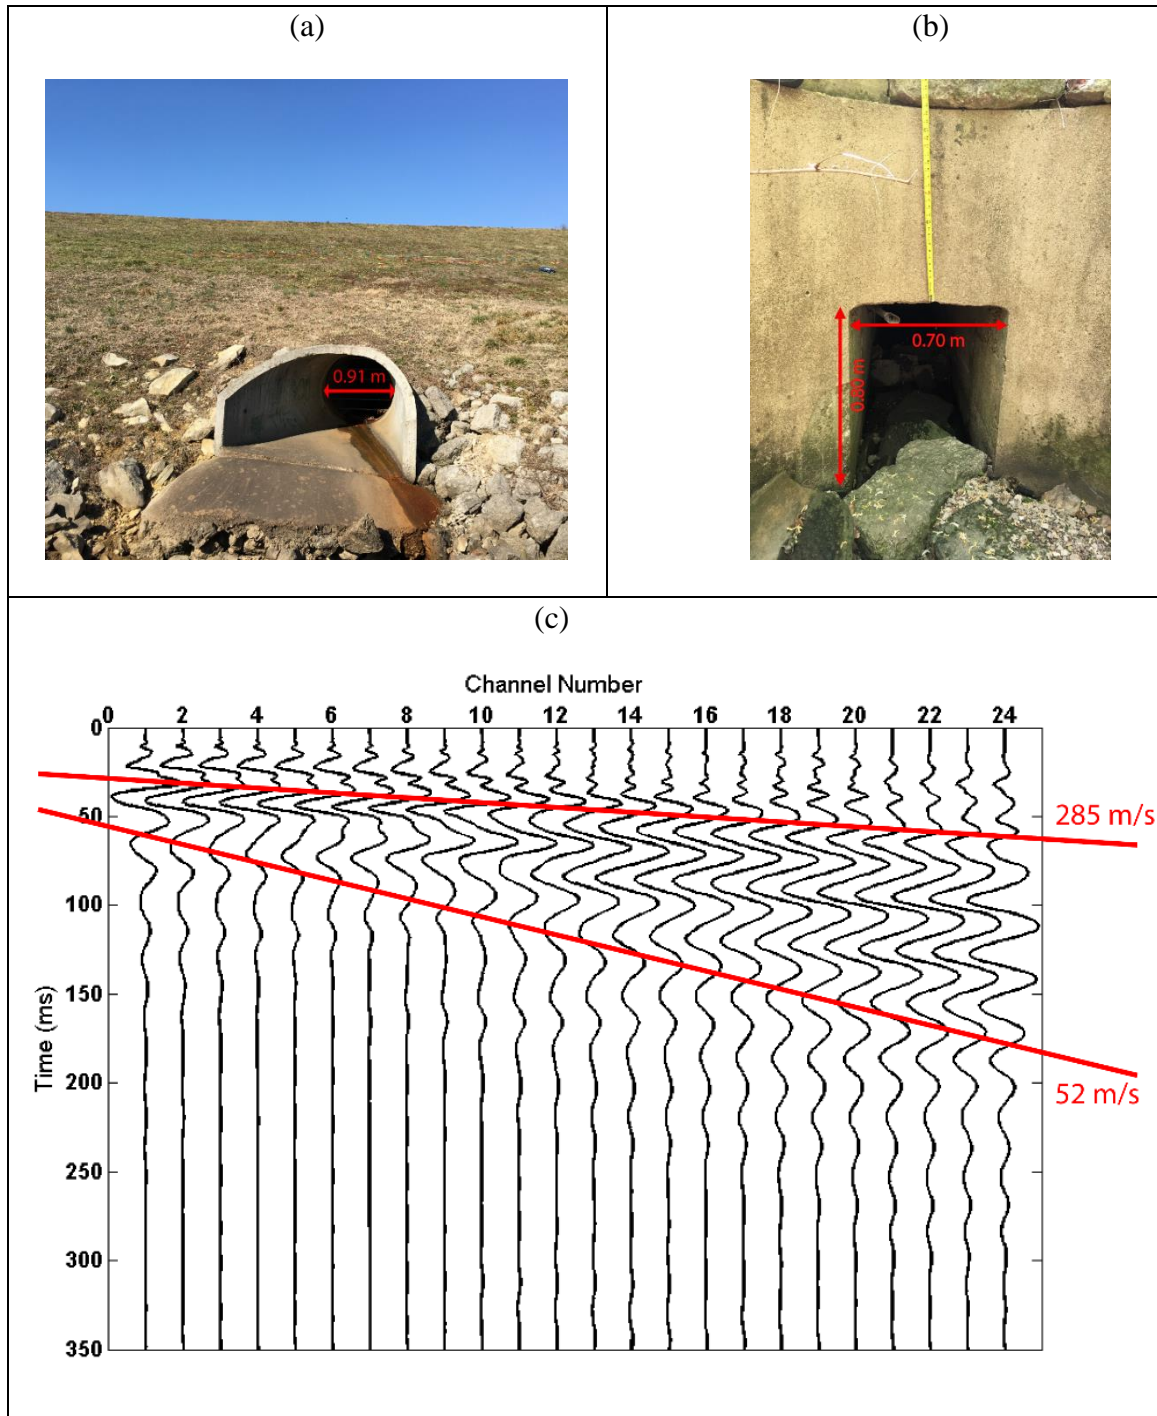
(a) and (b) Images of the earthen dam with the cylindrical concrete culvert and the concrete box culvert beneath asphalt concrete pavement, respectively. (c) a 24-channel seismic time-space profile acquired for the concrete box culvert. Two linear events are velocities of dispersive Rayleigh waves.
